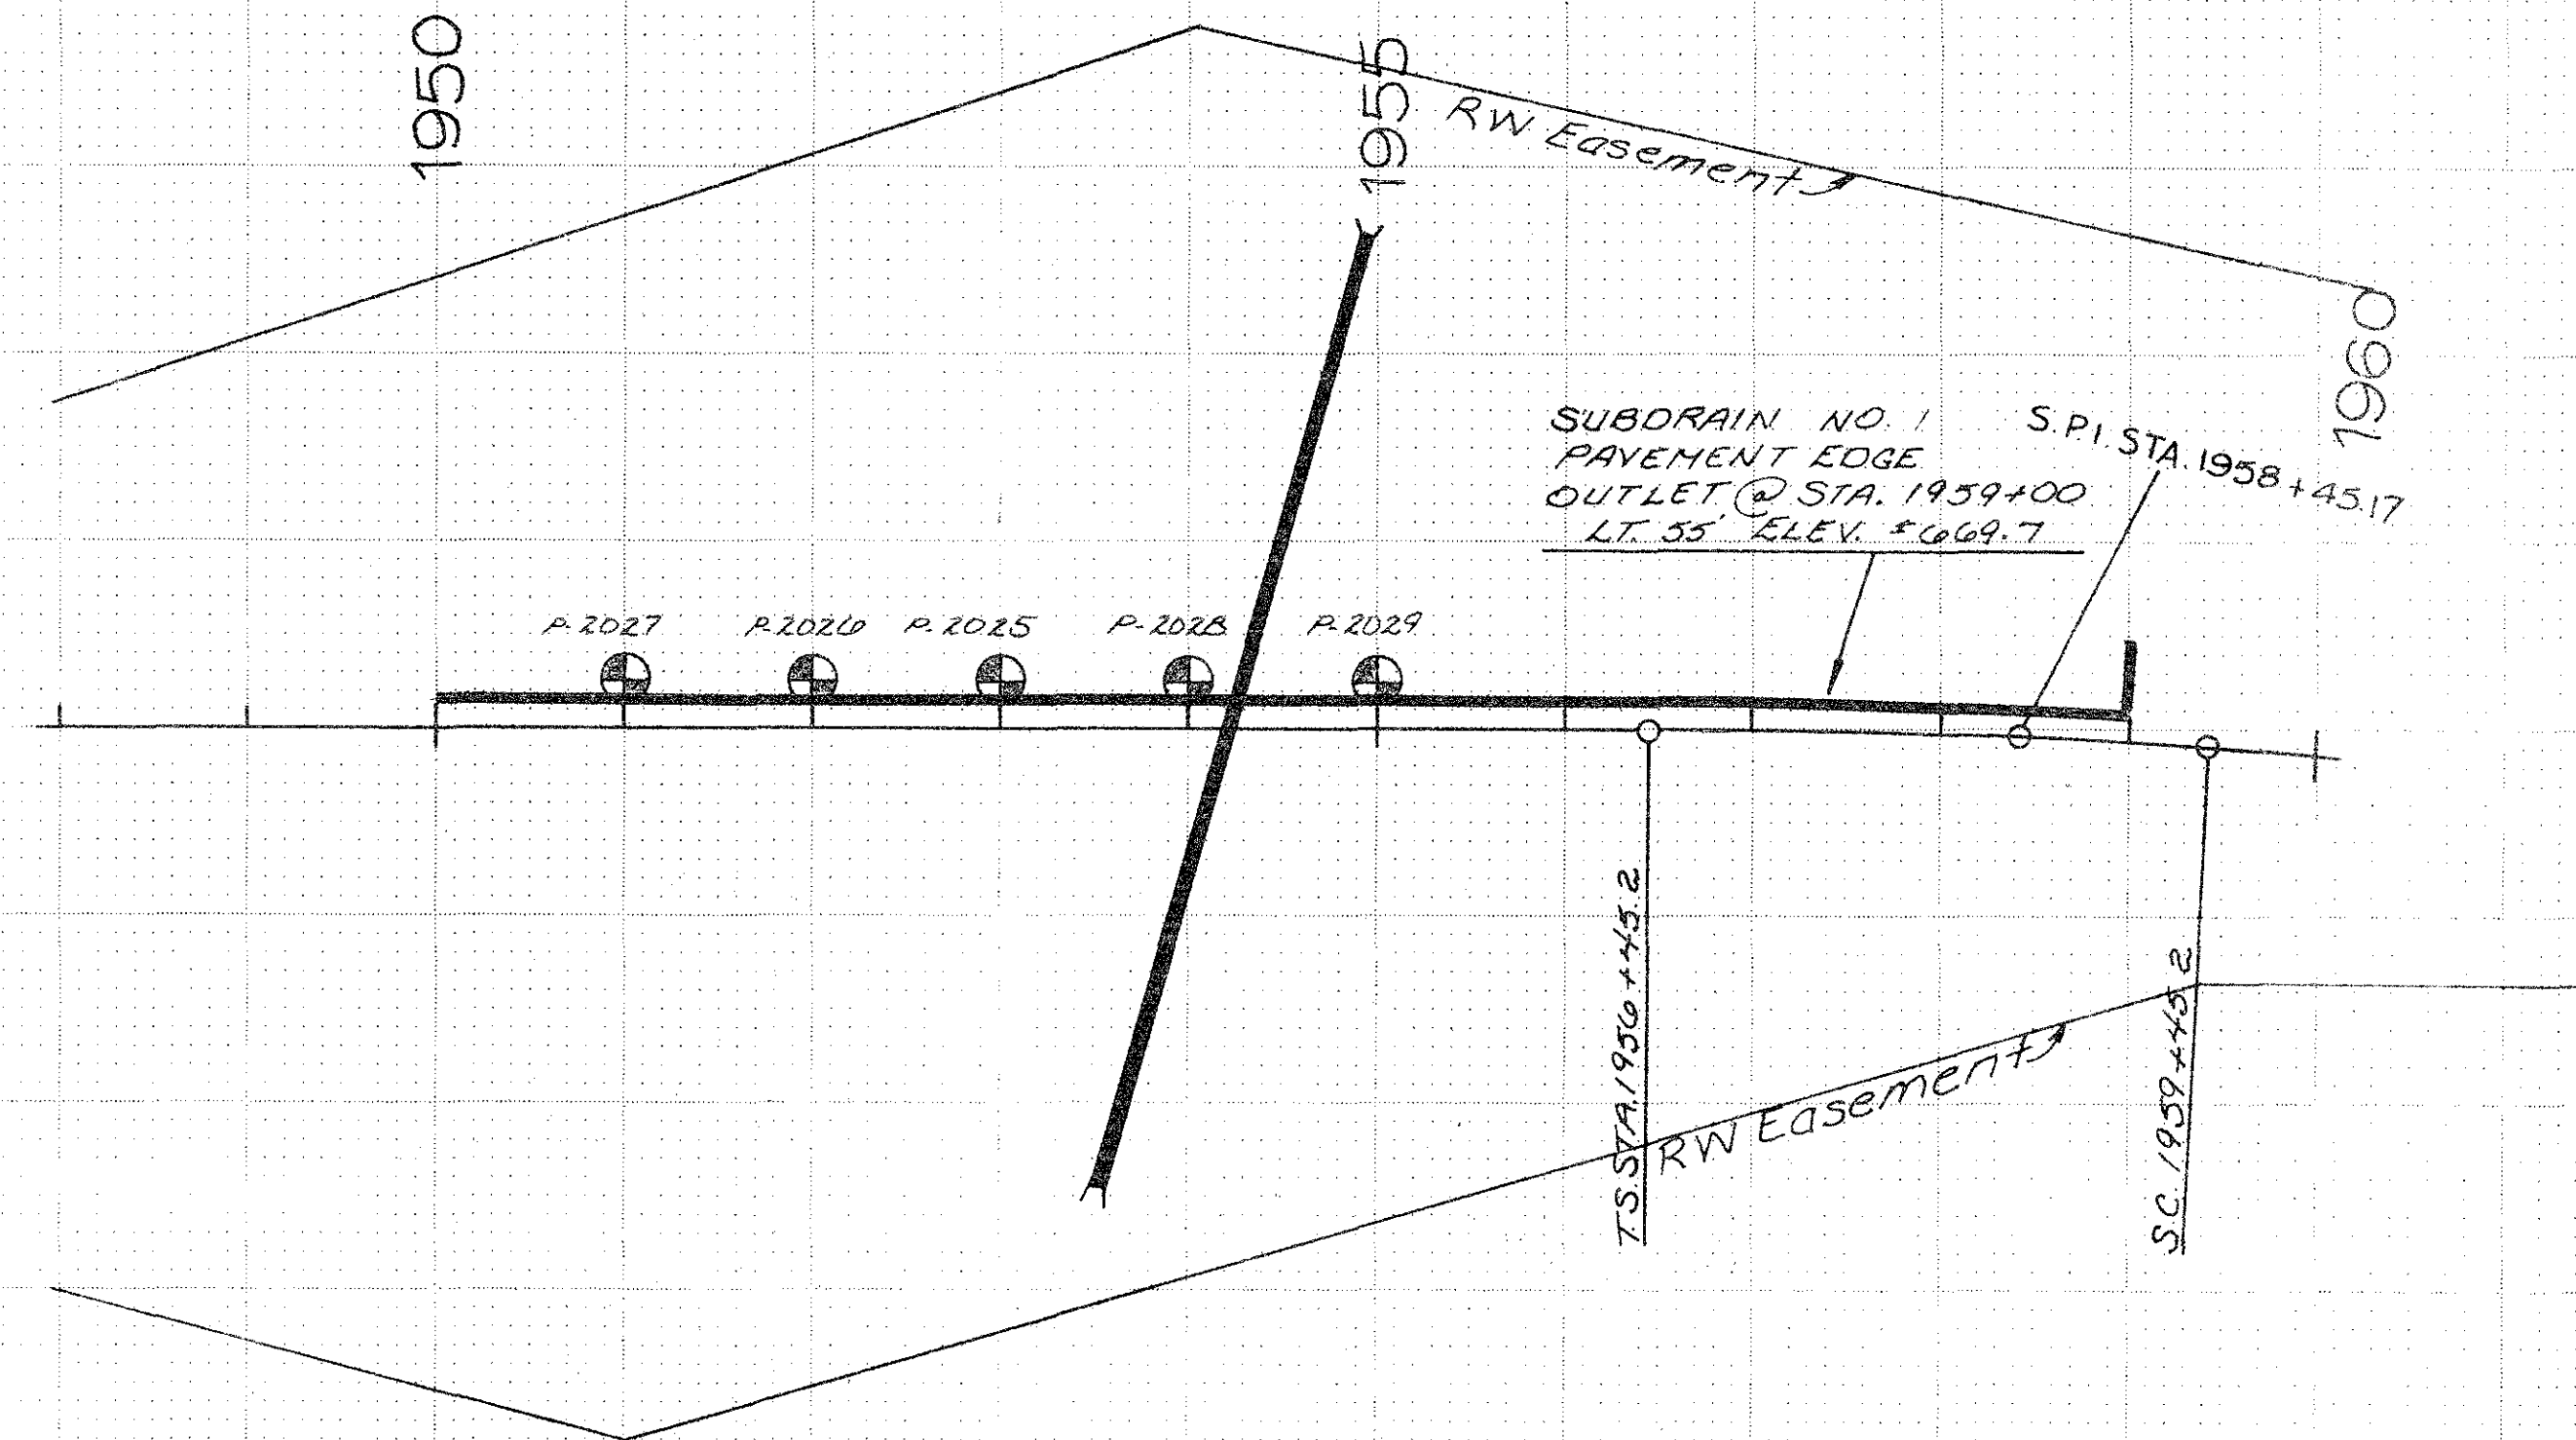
### DETAILS OF PAVEMENT EDGE SUBDRAIN
